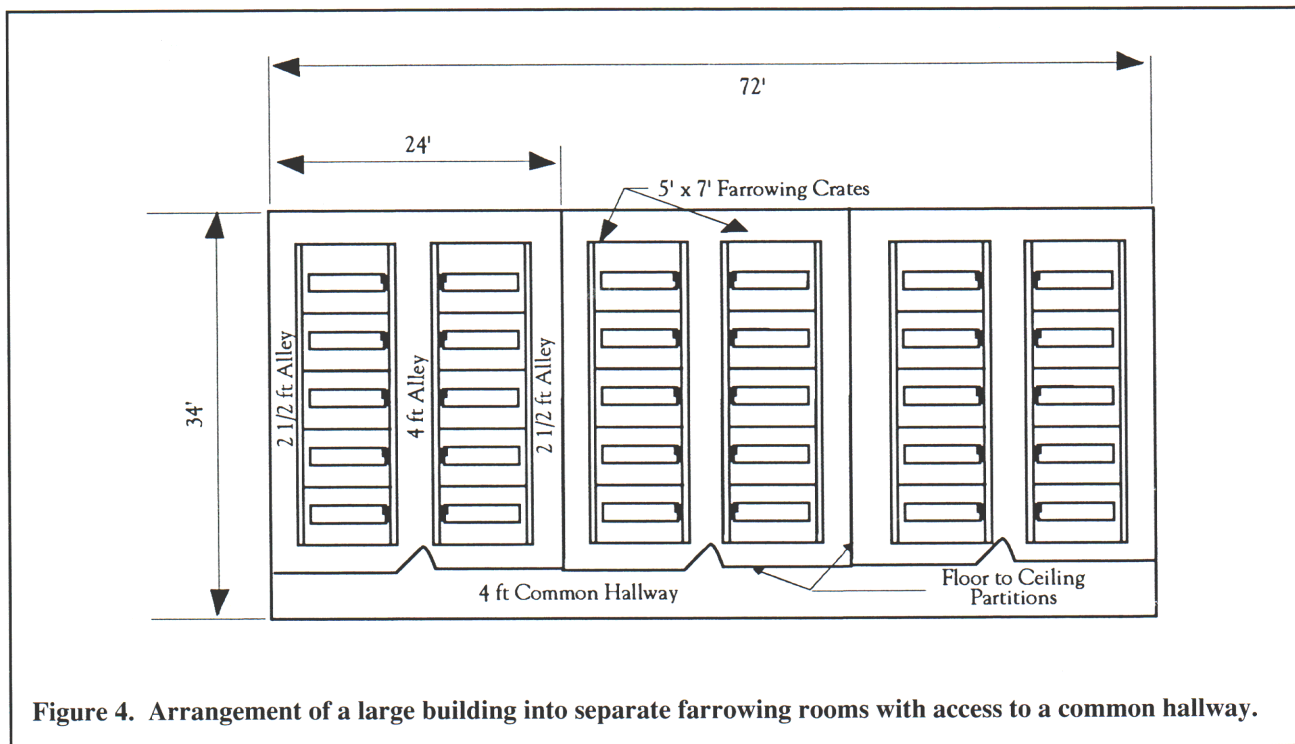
Arrangement of a large building into separate farrowing rooms with access to a common hallway.
